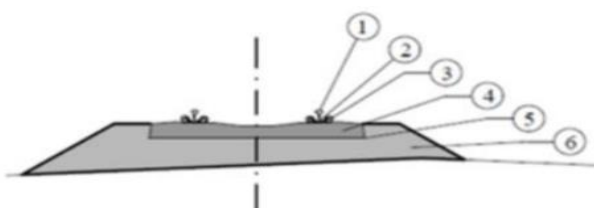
The structure of the railway track surface comprises: 1 – rail, 2 – rail fastening baseplate, 3 – rail fastening connectors, 4 – sleeper, 5 – under-sleeper pad, 6 – ballast [1]
